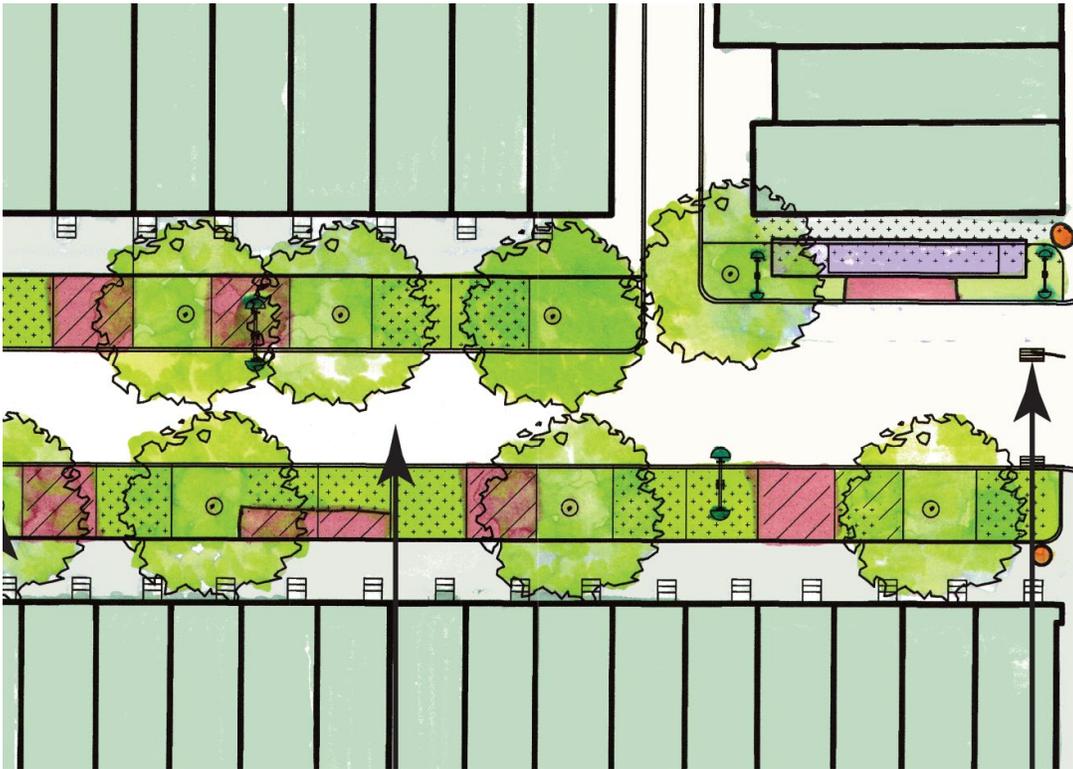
Close up Public Model showing light posts, ride waiting area and existing stormwater drain
